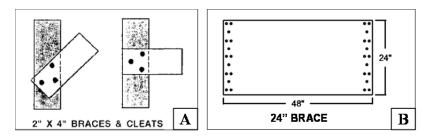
Brace Nailing Patterns A) 2x4 Connection B) 24in Plywood Brace Connection
